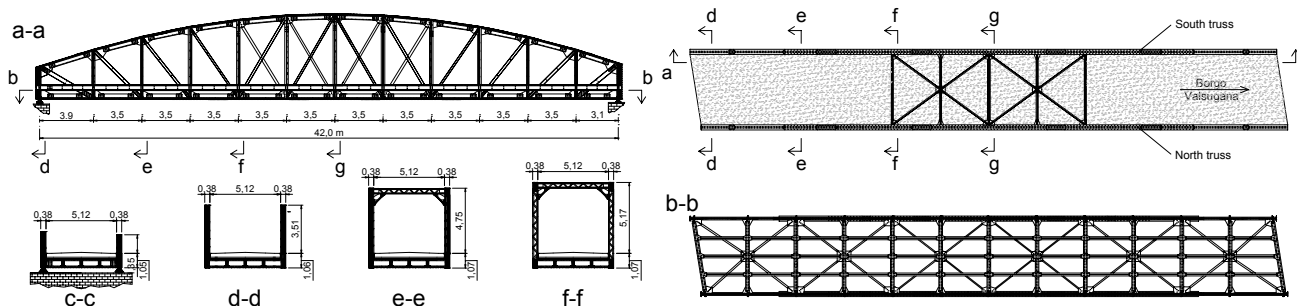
South truss, upper view, floor scheme and cross-sections of the SP109 bridge.
